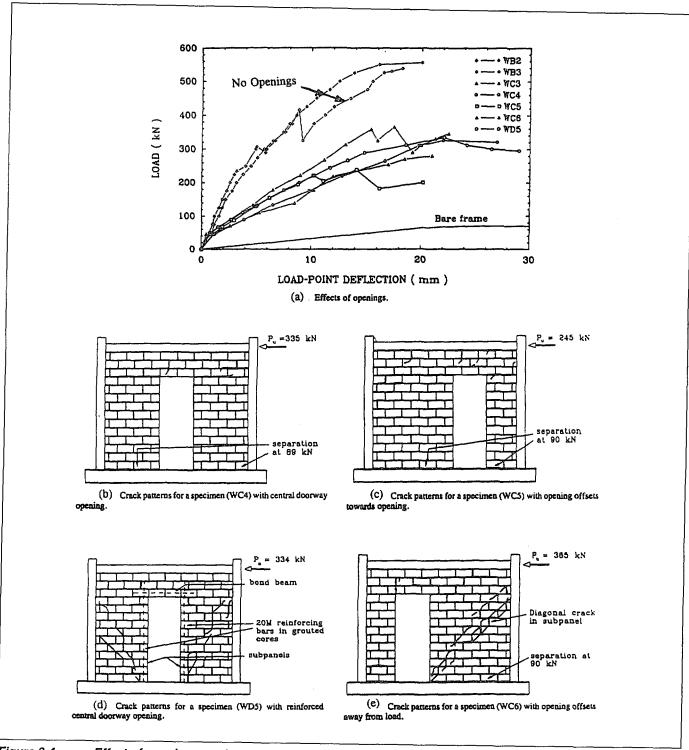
Effect of openings on the monotonic lateral-load performance of steel frame-masonry infill tested by Dawe and Seah (1988).
